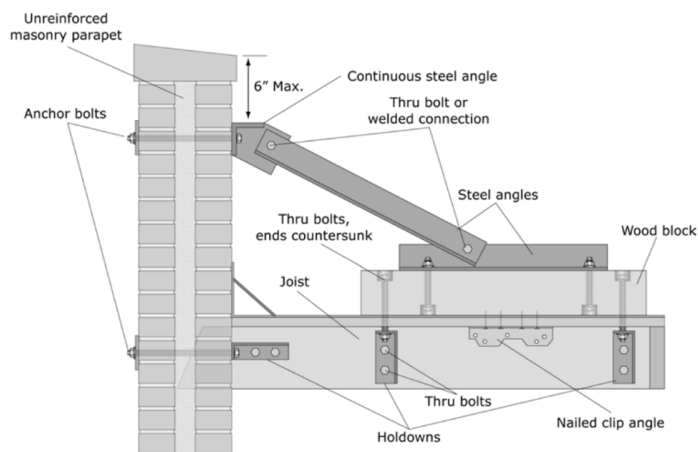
Typical brace configuration for URM parapet FEMA E-74 [10]
